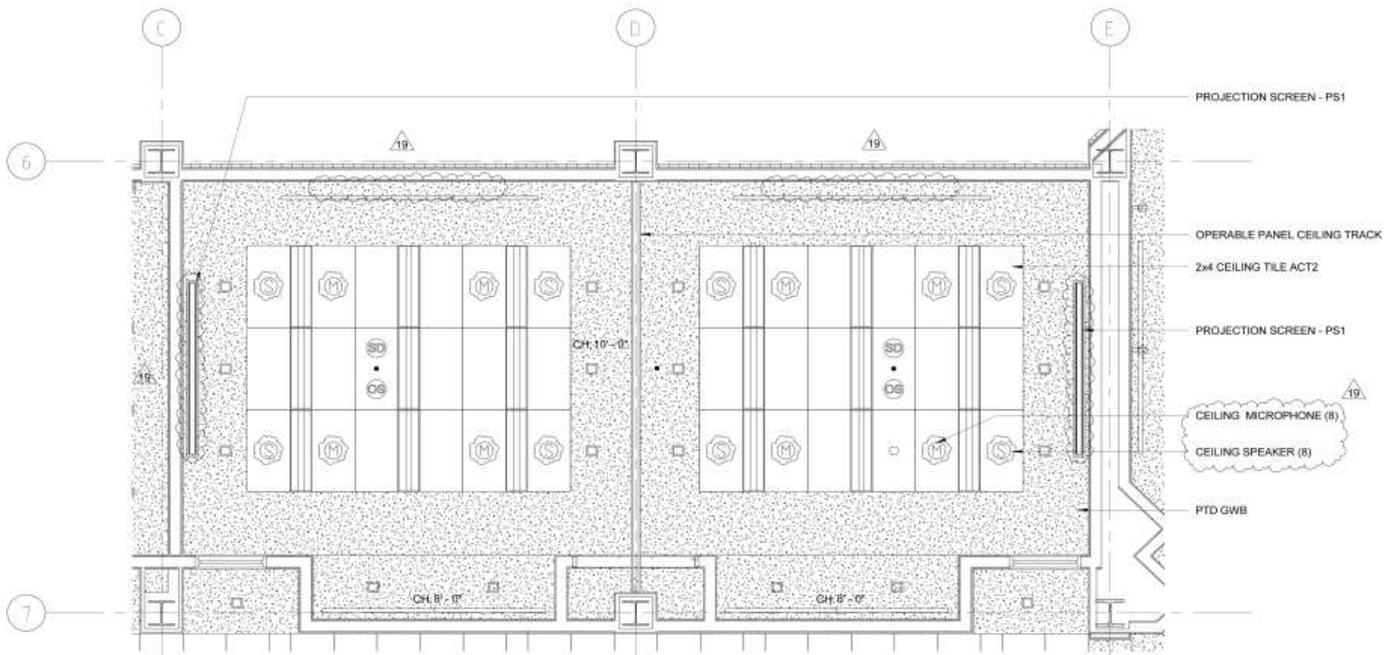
Seminar Rooms Reflected Ceiling Plan.
